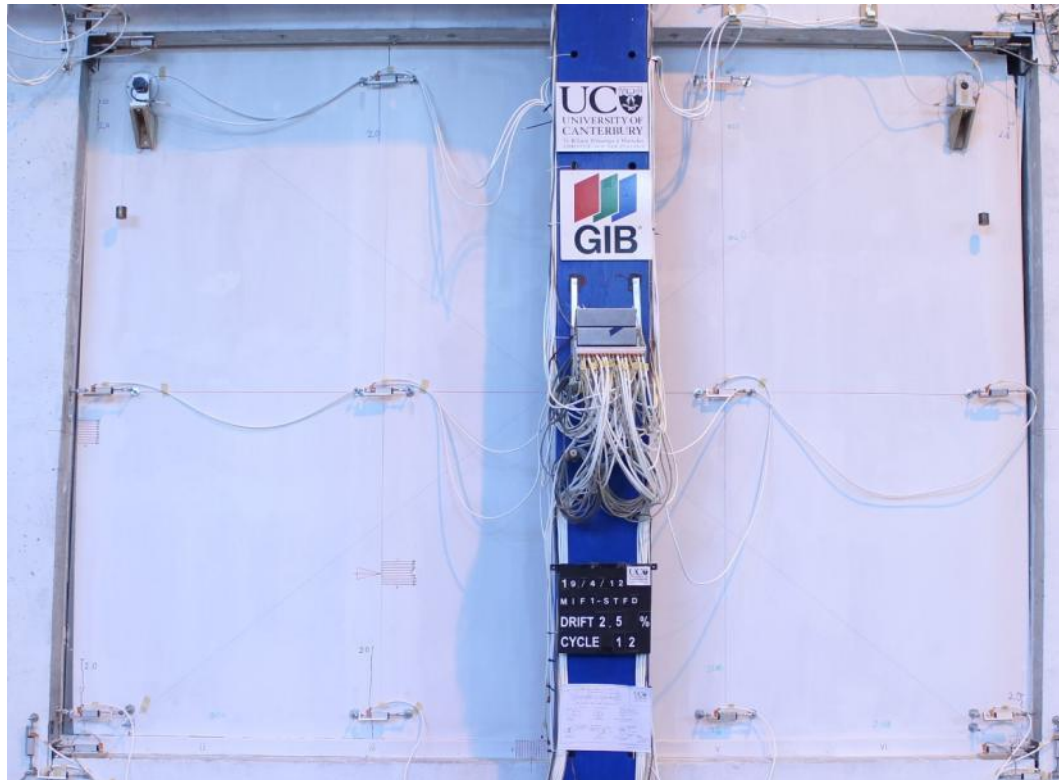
Low damage steel framed drywall specimen MIF1-STFD at +2.0% drift: Pull-out of the exterior studs of the drywall
